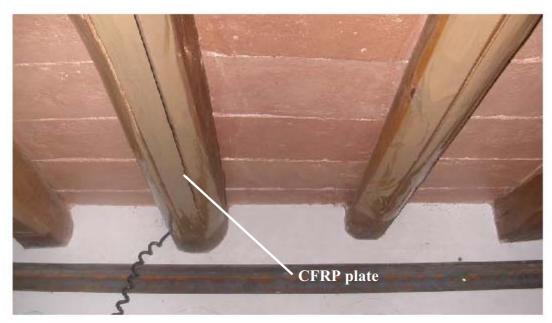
Strengthening intervention on the secondary beams (Designer: ing. A. Giannantoni, in collaboration with prof. A. Borri).
